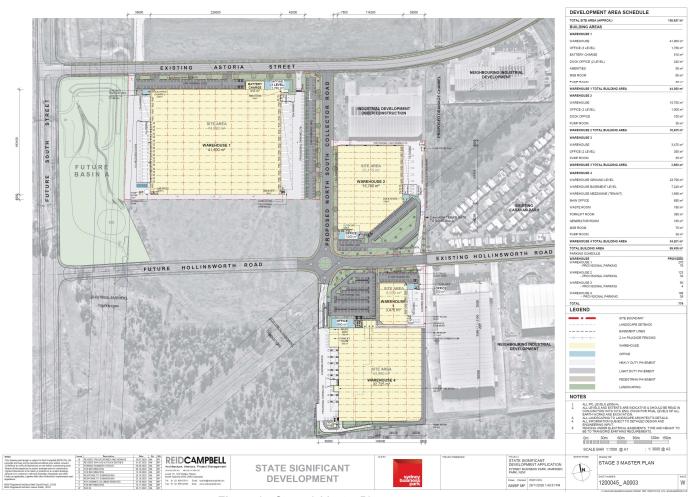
Stage 3 Master Plan (Source: Reid Campbell)
